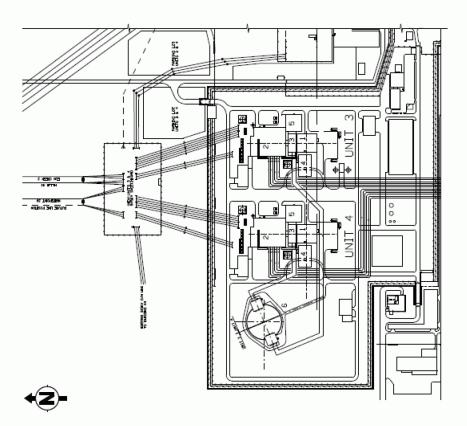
S-5 Principal Plant Structures within the STP Site Area
